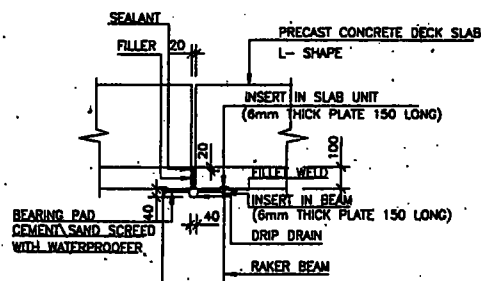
JOINT DETAIL OF DECK SLAB/RAKER BEAM
